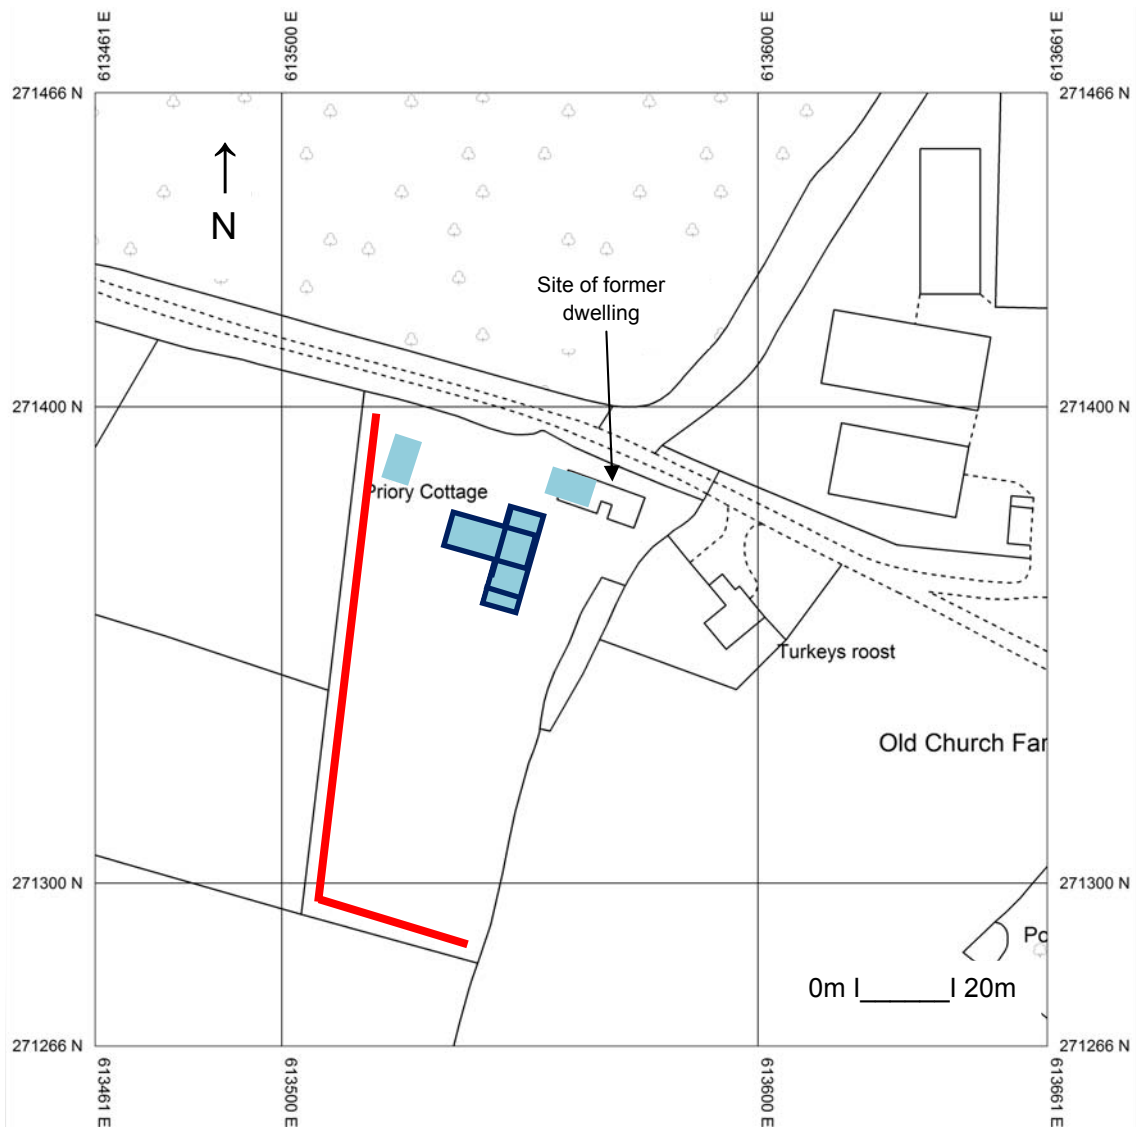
Monitored dwelling footprint (foundation trenches- dark blue, cable trench- red)
